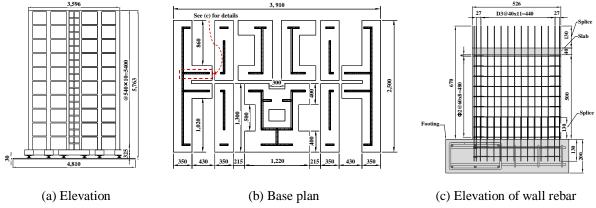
Dimensions of 1/5 scale model (unit: mm)
